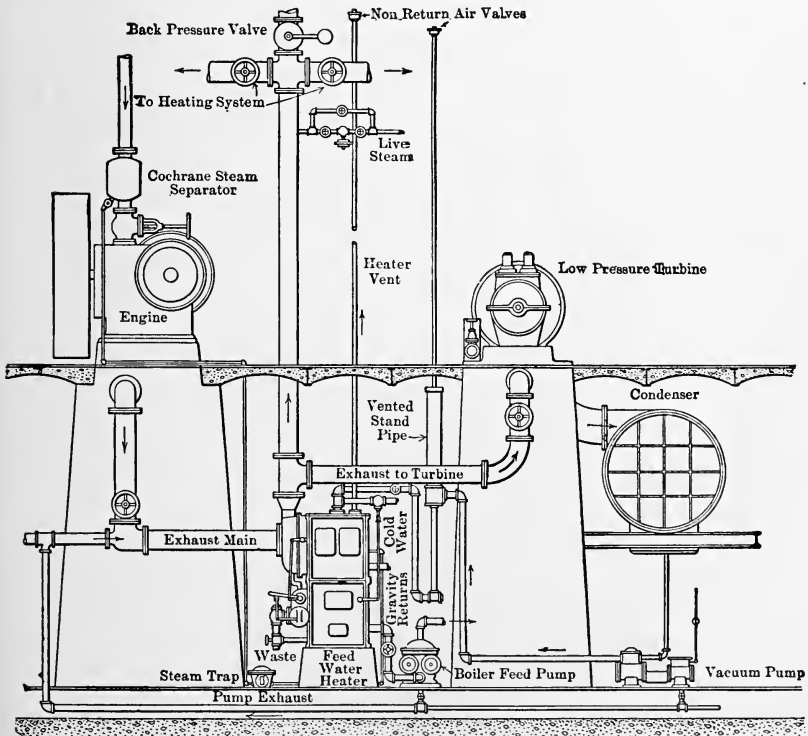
Open Heater in Connection with a Low-pressure Turbine.
